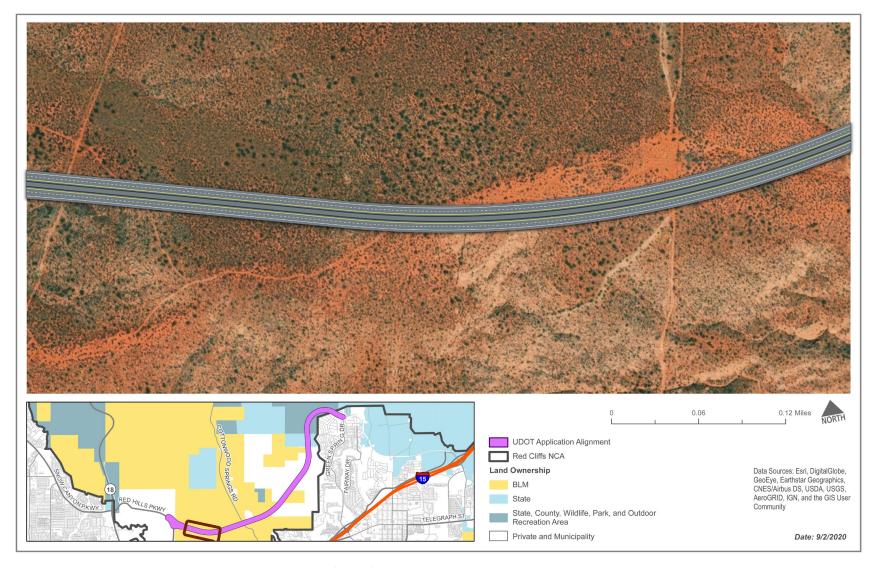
UDOT Application Alignment Plan View (2 of 9)
